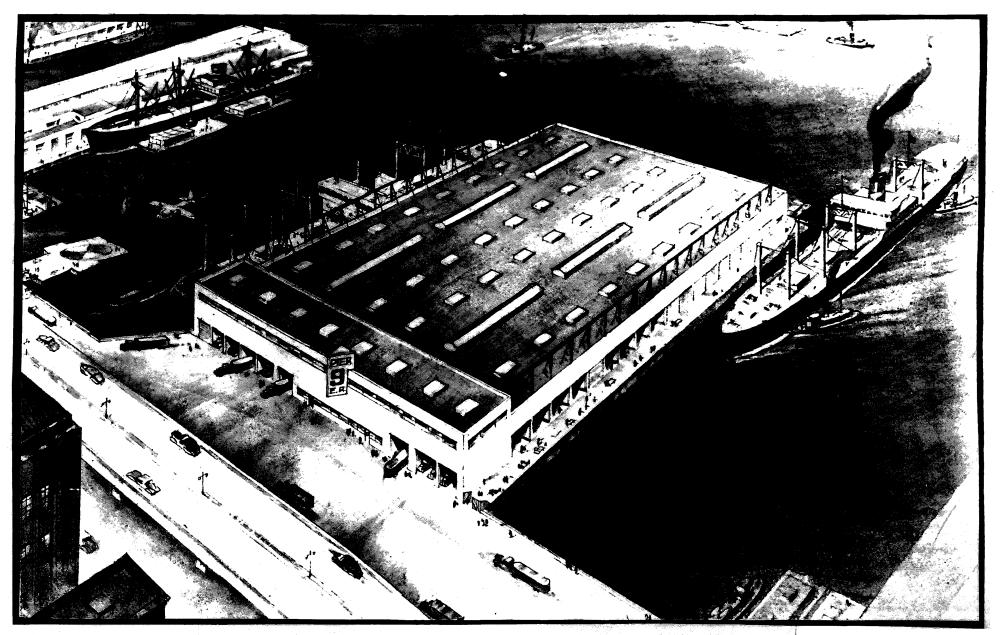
Proposed new Pier 9, foot of Old Slip, East River.
